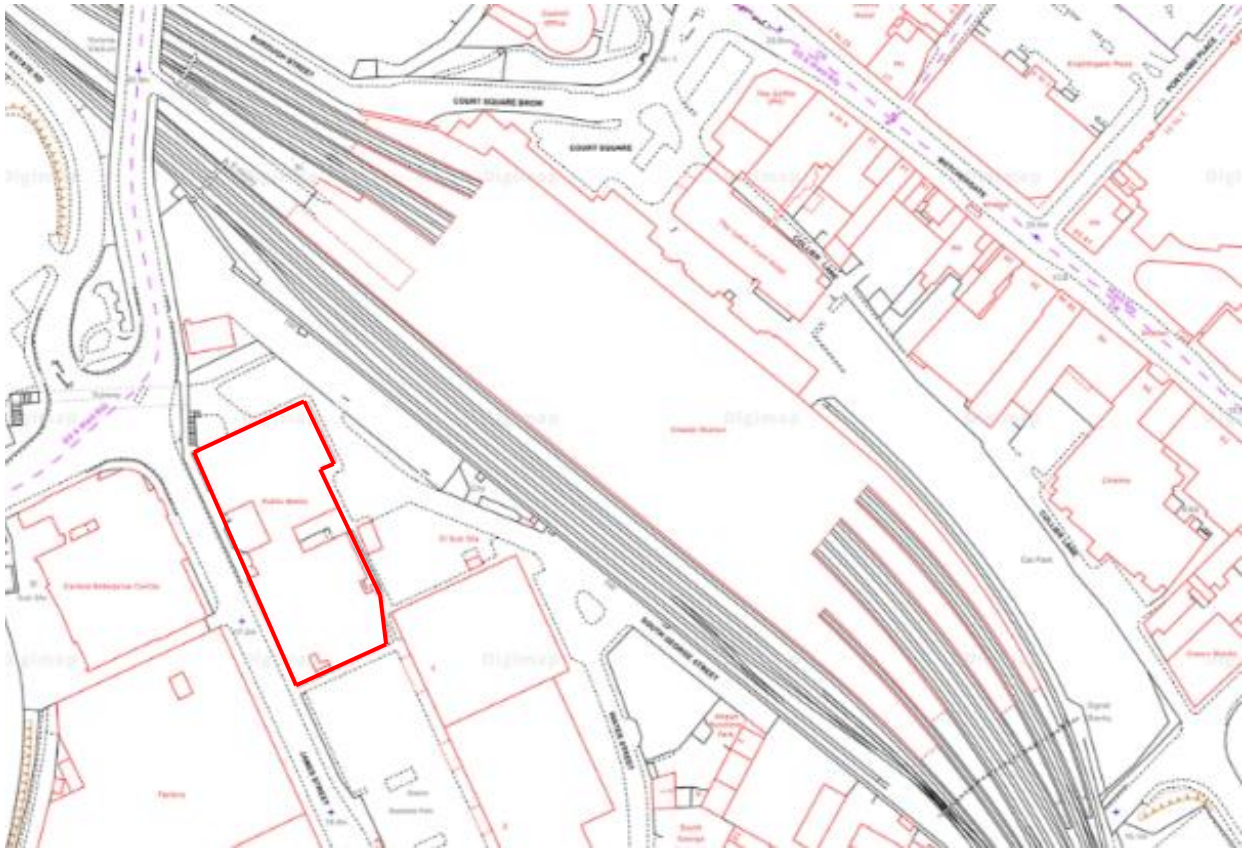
James Street Baths Site location plan Site Outlined in Bold Red
